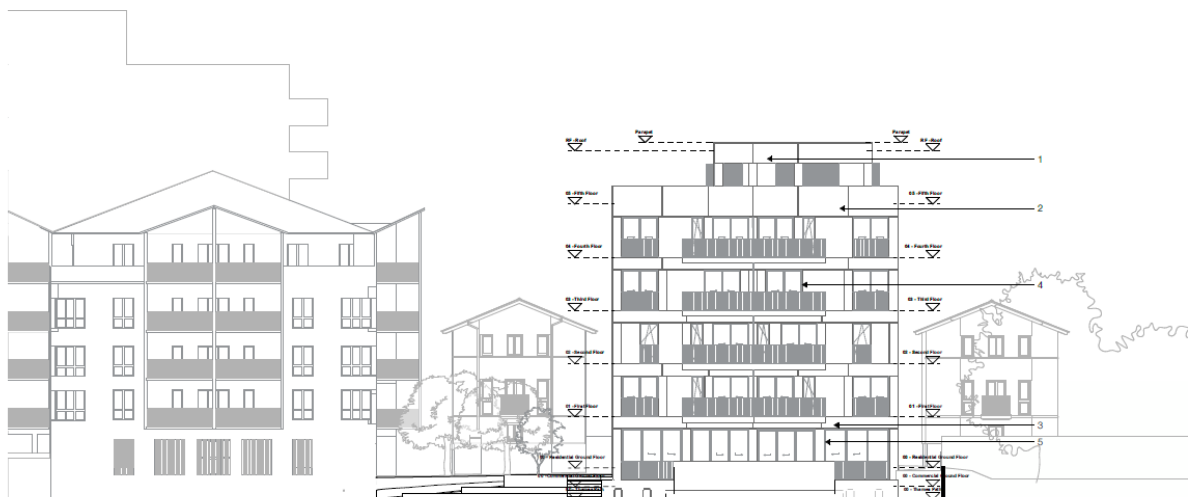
Proposed south elevation in context with Atlantic Court to the west
